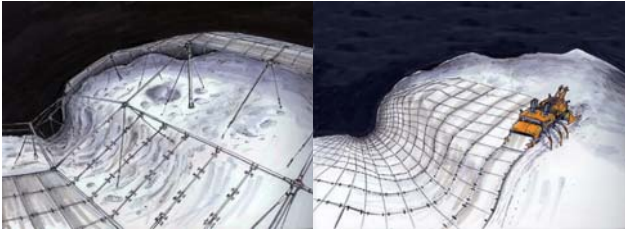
Notional Shell Construction Techniques (Scaffolding Approach or Surface Bonding Approach)
